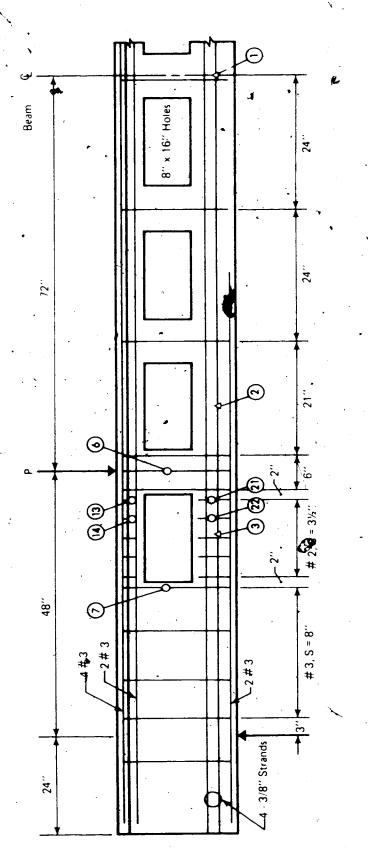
Reinforcement Details and Strain Gage Locations for Beam 2-16-4
